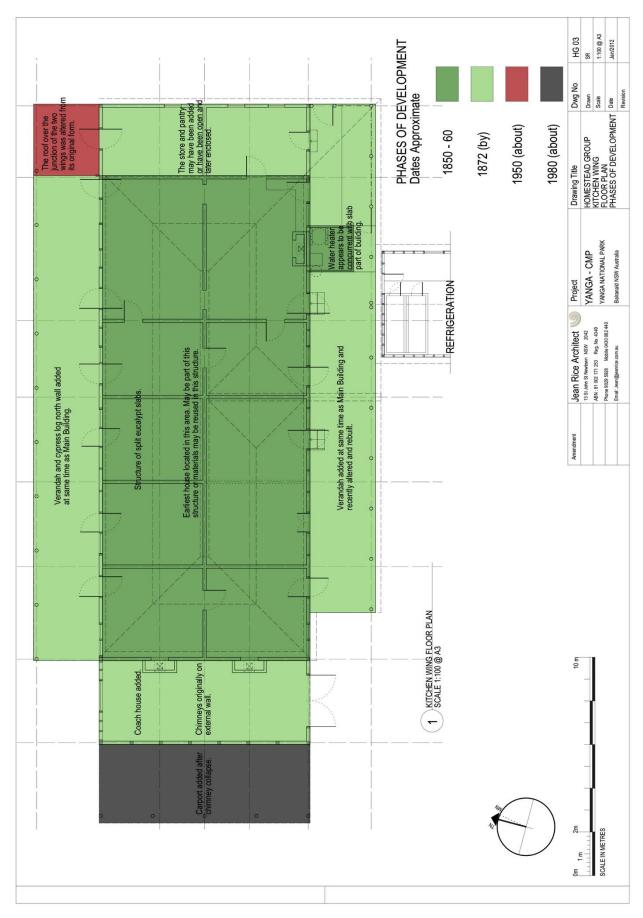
Homestead Group Kitchen Wing floor plan showing phases of development. Jean Rice Architect, site assessment 2009.
